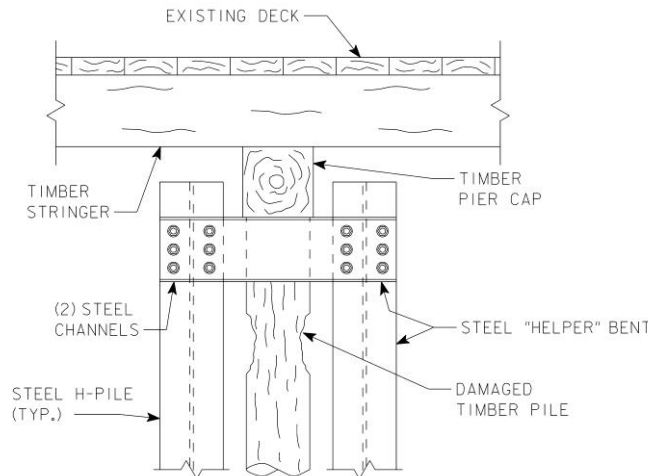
Helper Bent for Damaged Timber Pile
